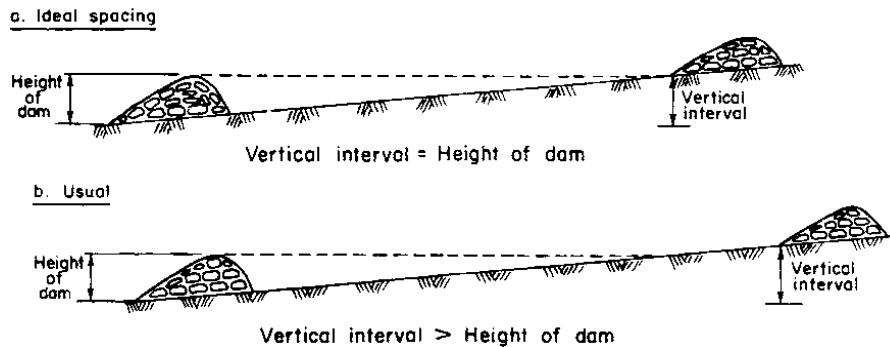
Spacing of rock dams (Source: Berton, 1989)
